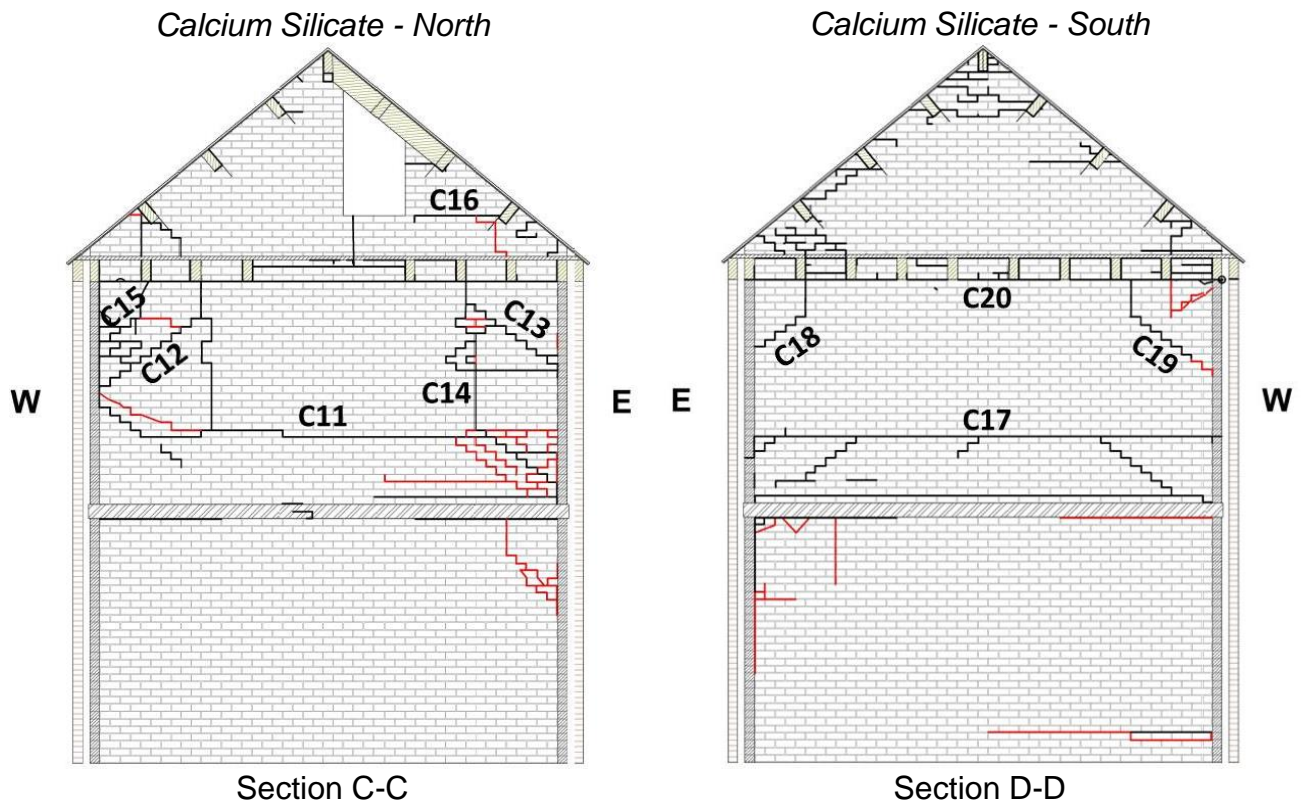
EQ-NPR IS 133% cracks - Calcium silicate transversal walls.
